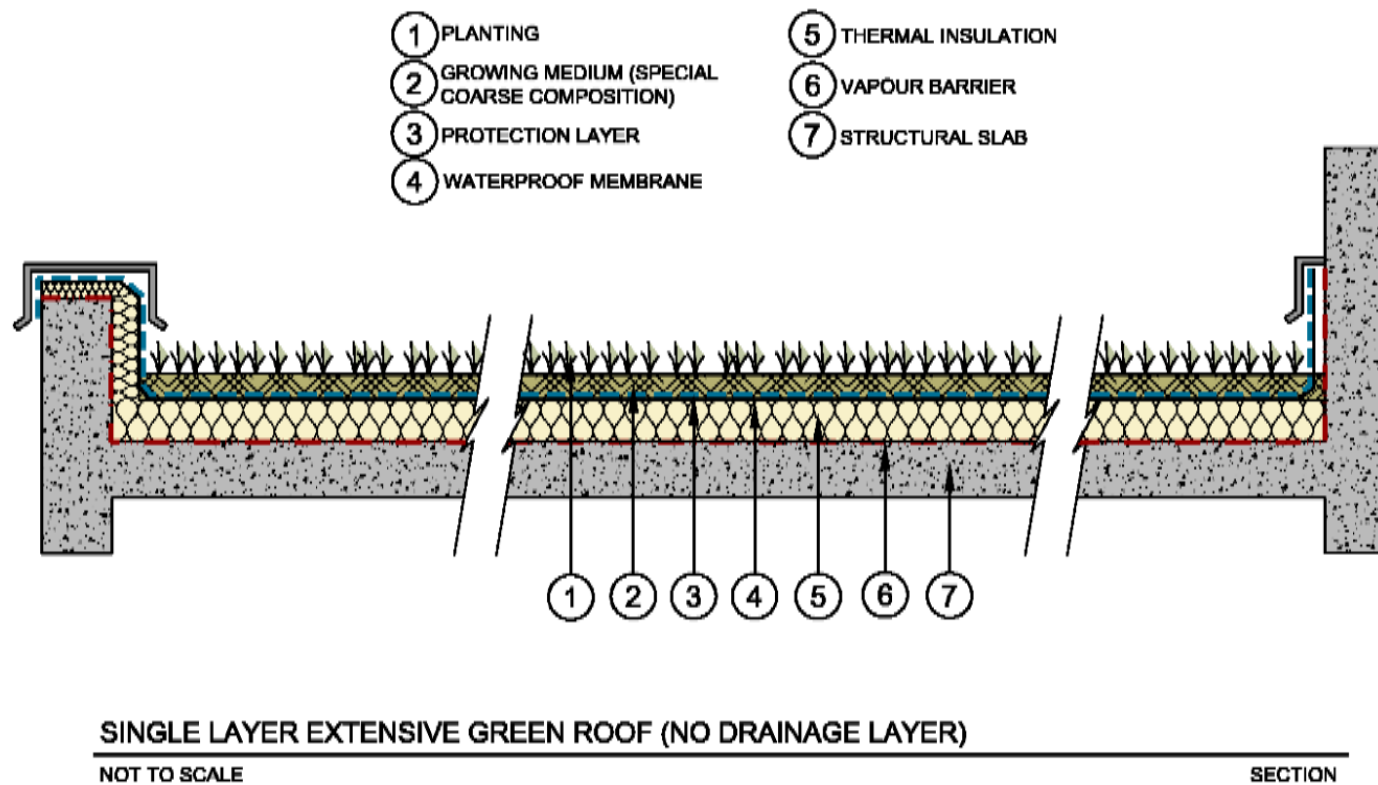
Single Layer Extensive Green Roof (No Drainage Layer) (Not to scale, Section)
